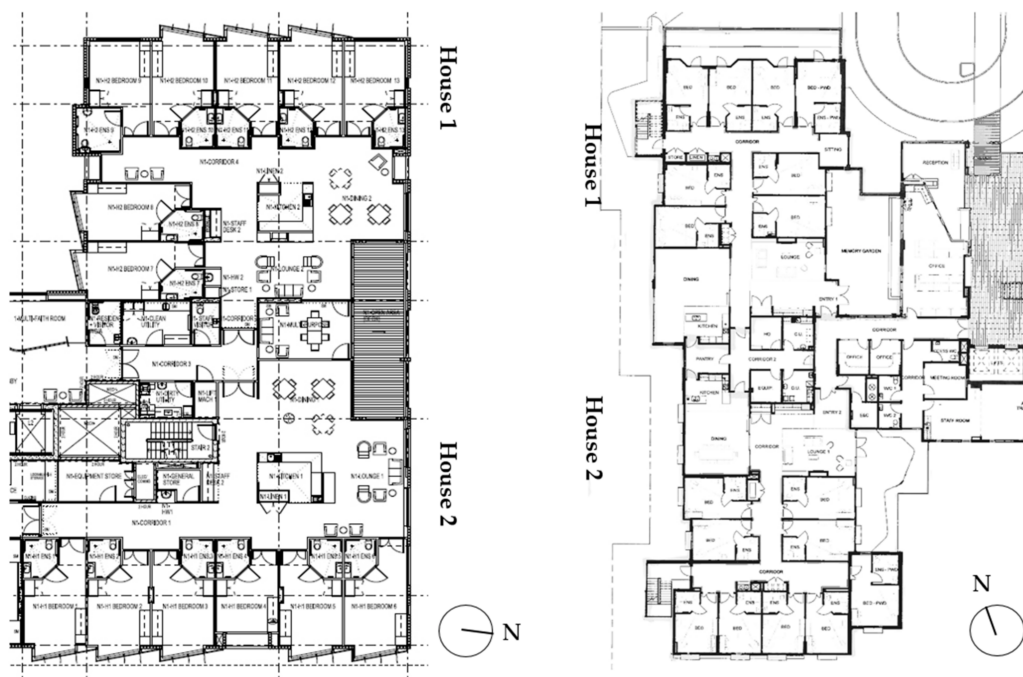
Floor plans of Facility A (left) and Facility C (right).
